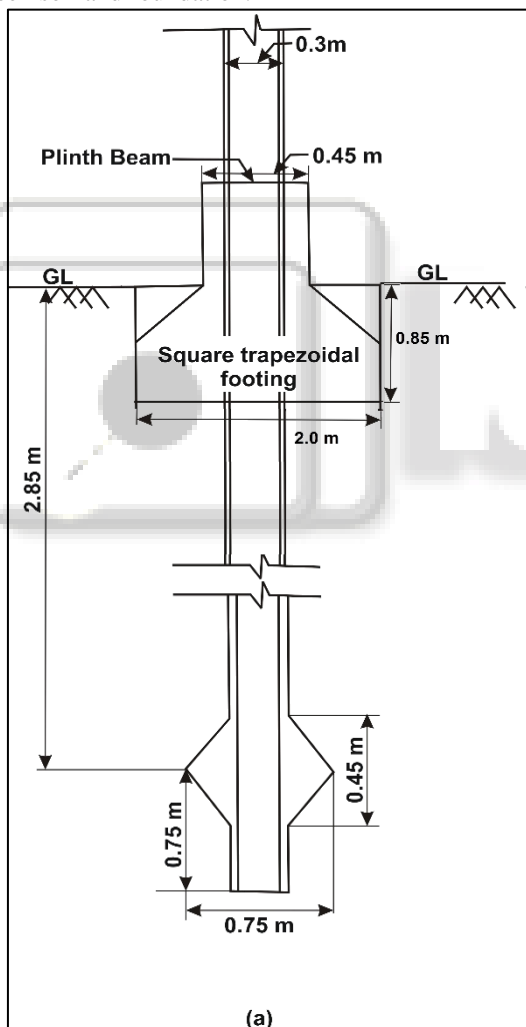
Geometry of Single Under-Reamed Pile with Footing
